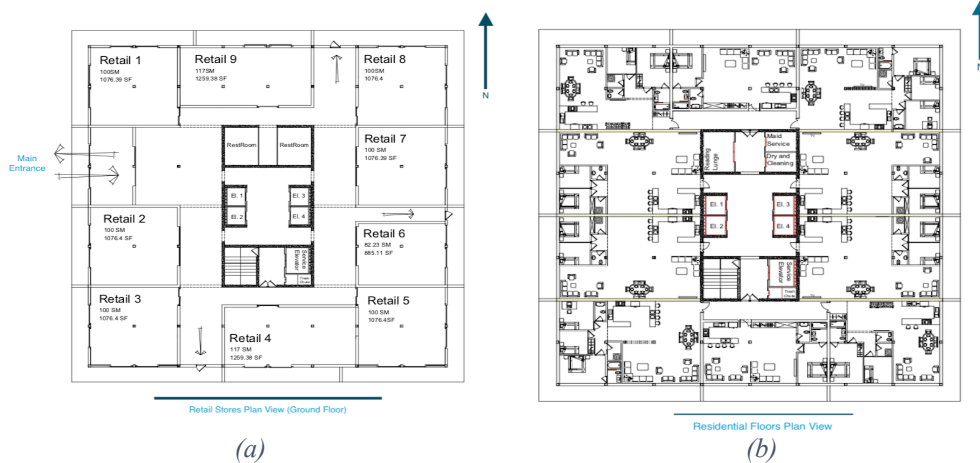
Plan view of the (a) Ground floor (b) residential floors [1].
